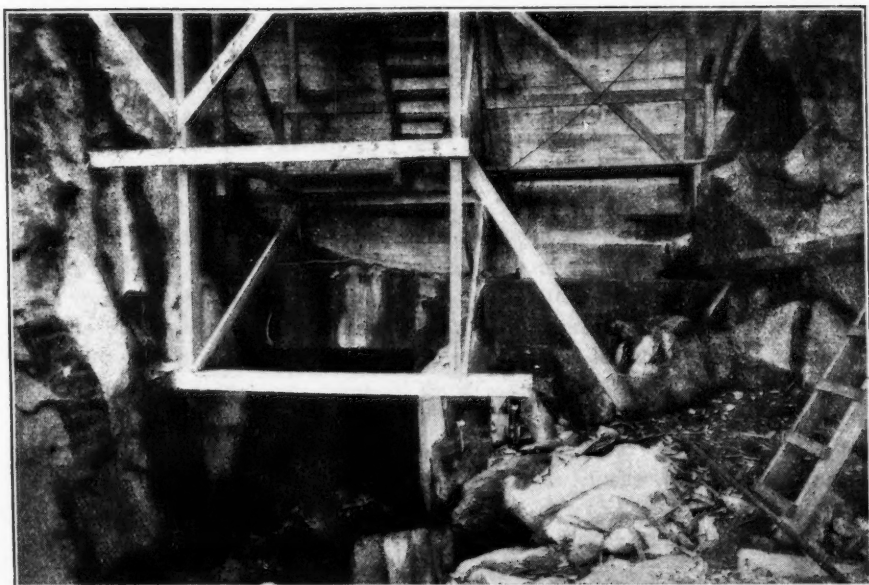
DOWN-STREAM SIDE AT BOTTOM OF STEVENSON CREEK TEST DAM, SHOWING UNDER-SLUICE.
